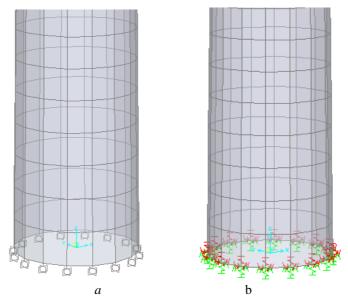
Modeling details of the wind turbine tower, connection at foundation level: a – Rigid base; b – flexible base.
